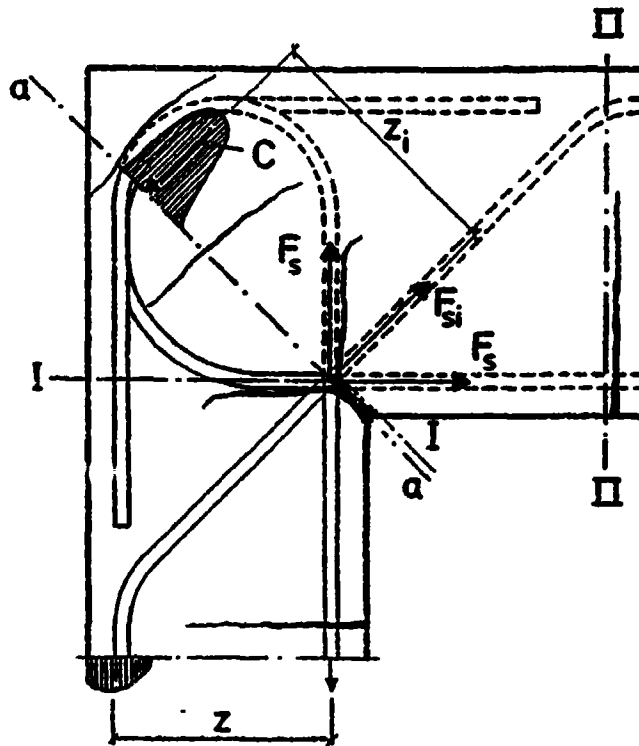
Internal force system in the developed corner reinforcement detail. (Nilsson '73)
